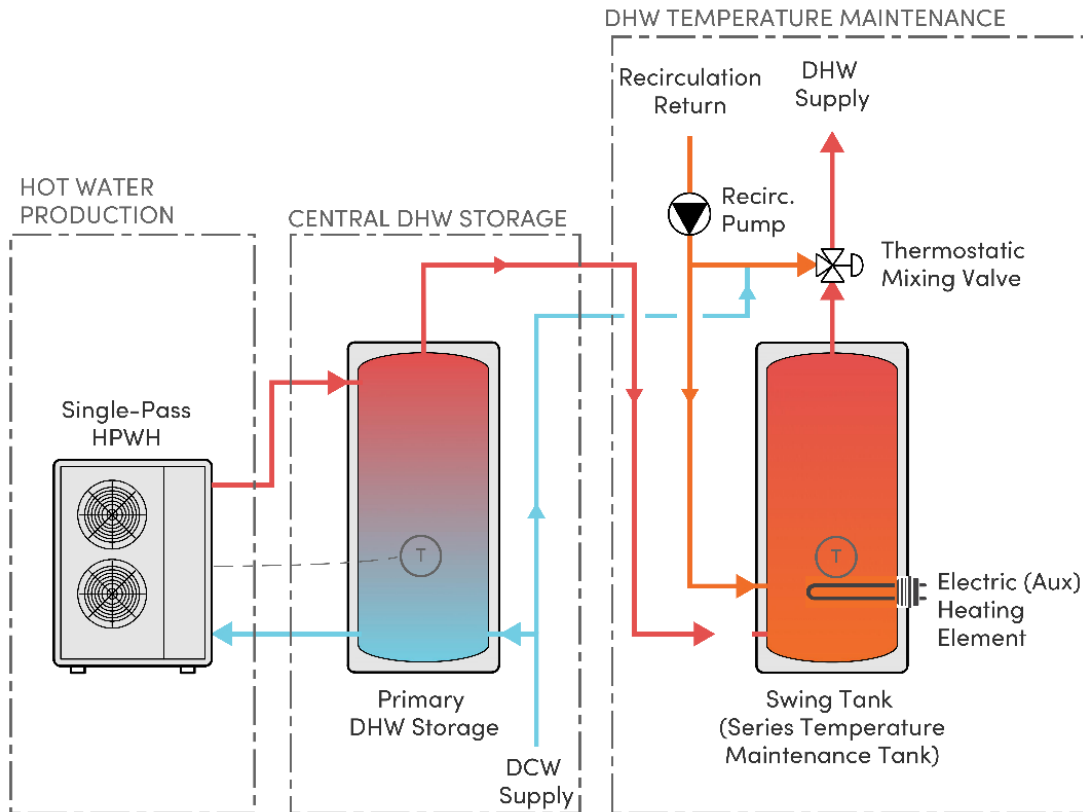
CENTRAL HEAT PUMP WATER HEATER SYSTEM
